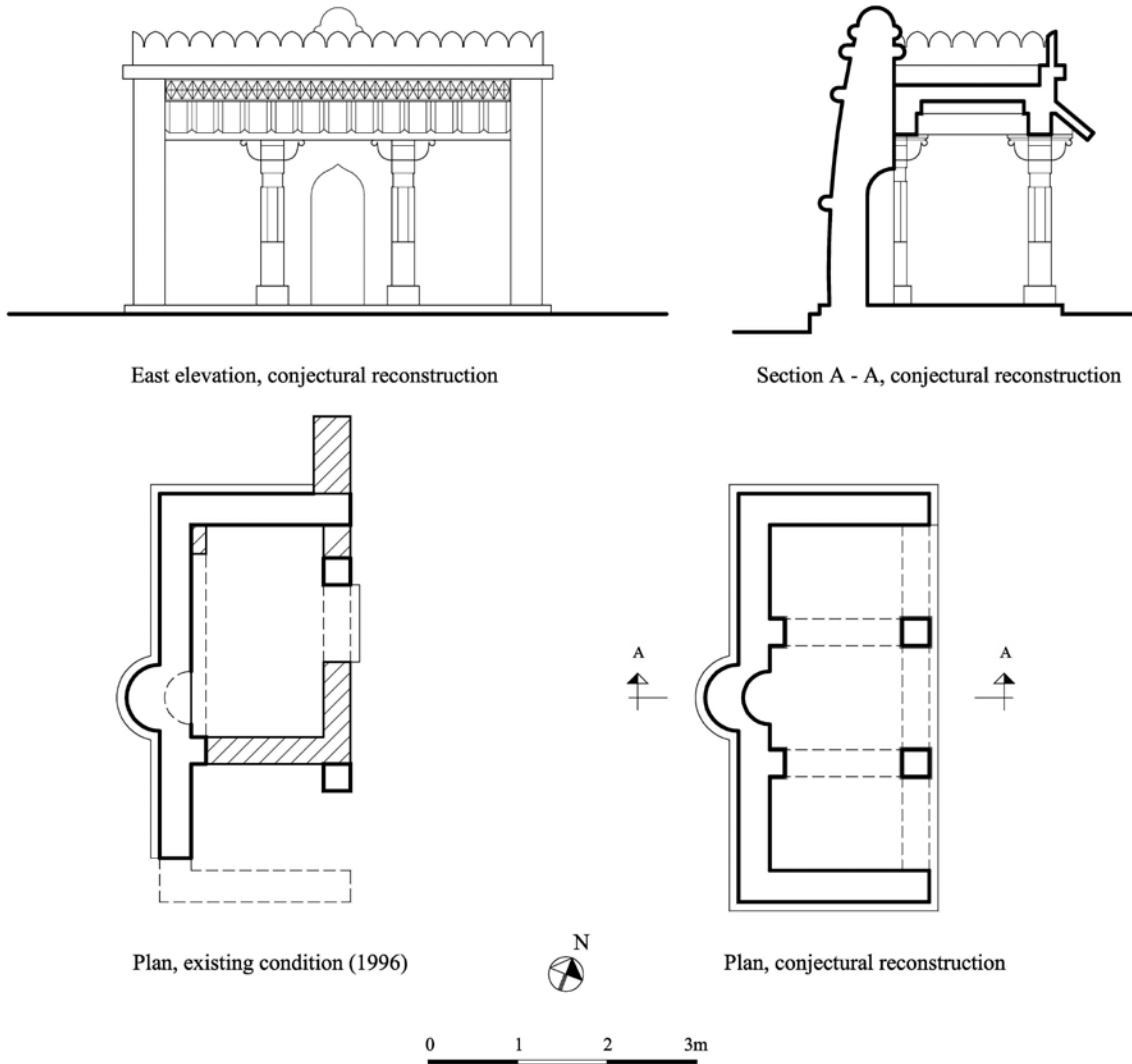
Mosque at Sunset Point, plan showing the present condition and plan, cross-section and east elevation showing the building in its probable original condition.
